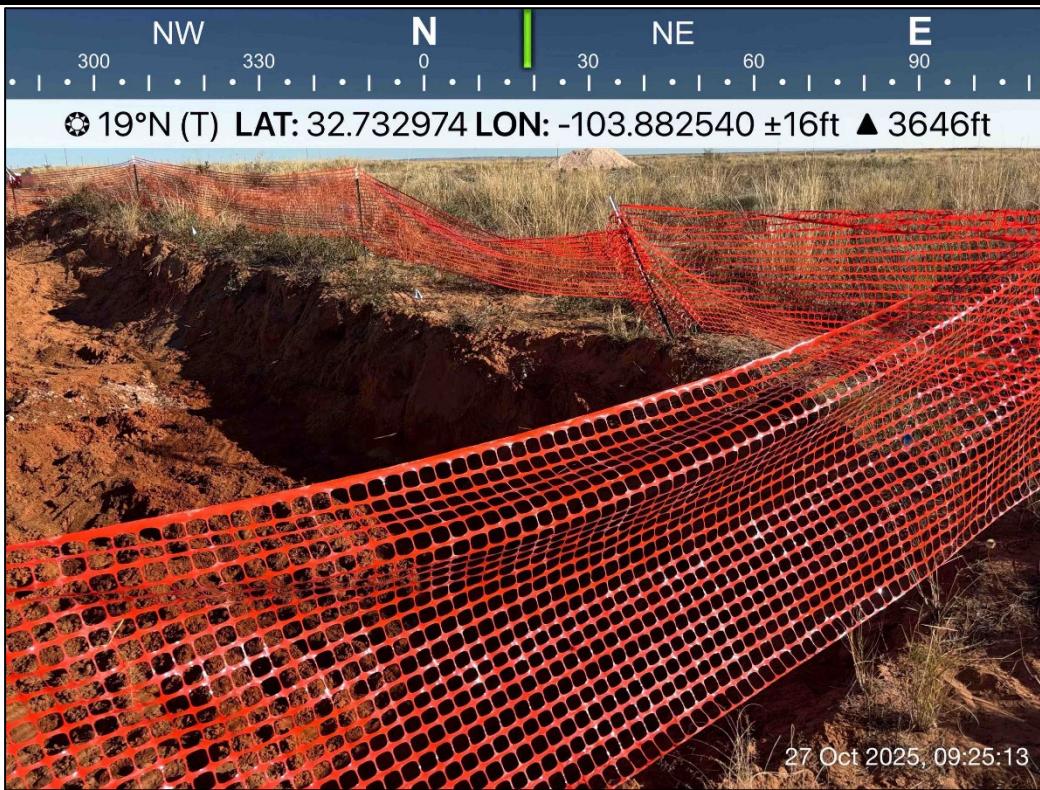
Northeastern view of excavation extent. 10/27/2025
